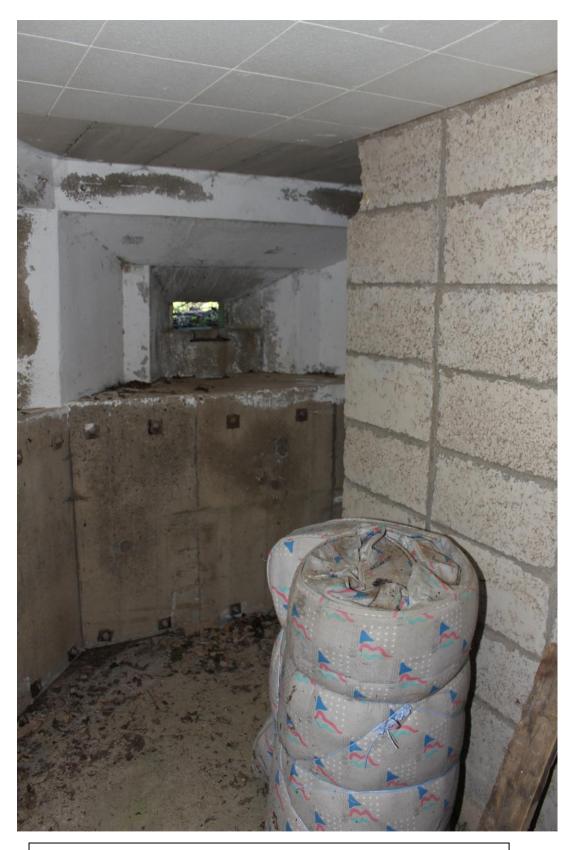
photo indicating modern additions including a mattress, paint on the walls and polystyrene roof panels
